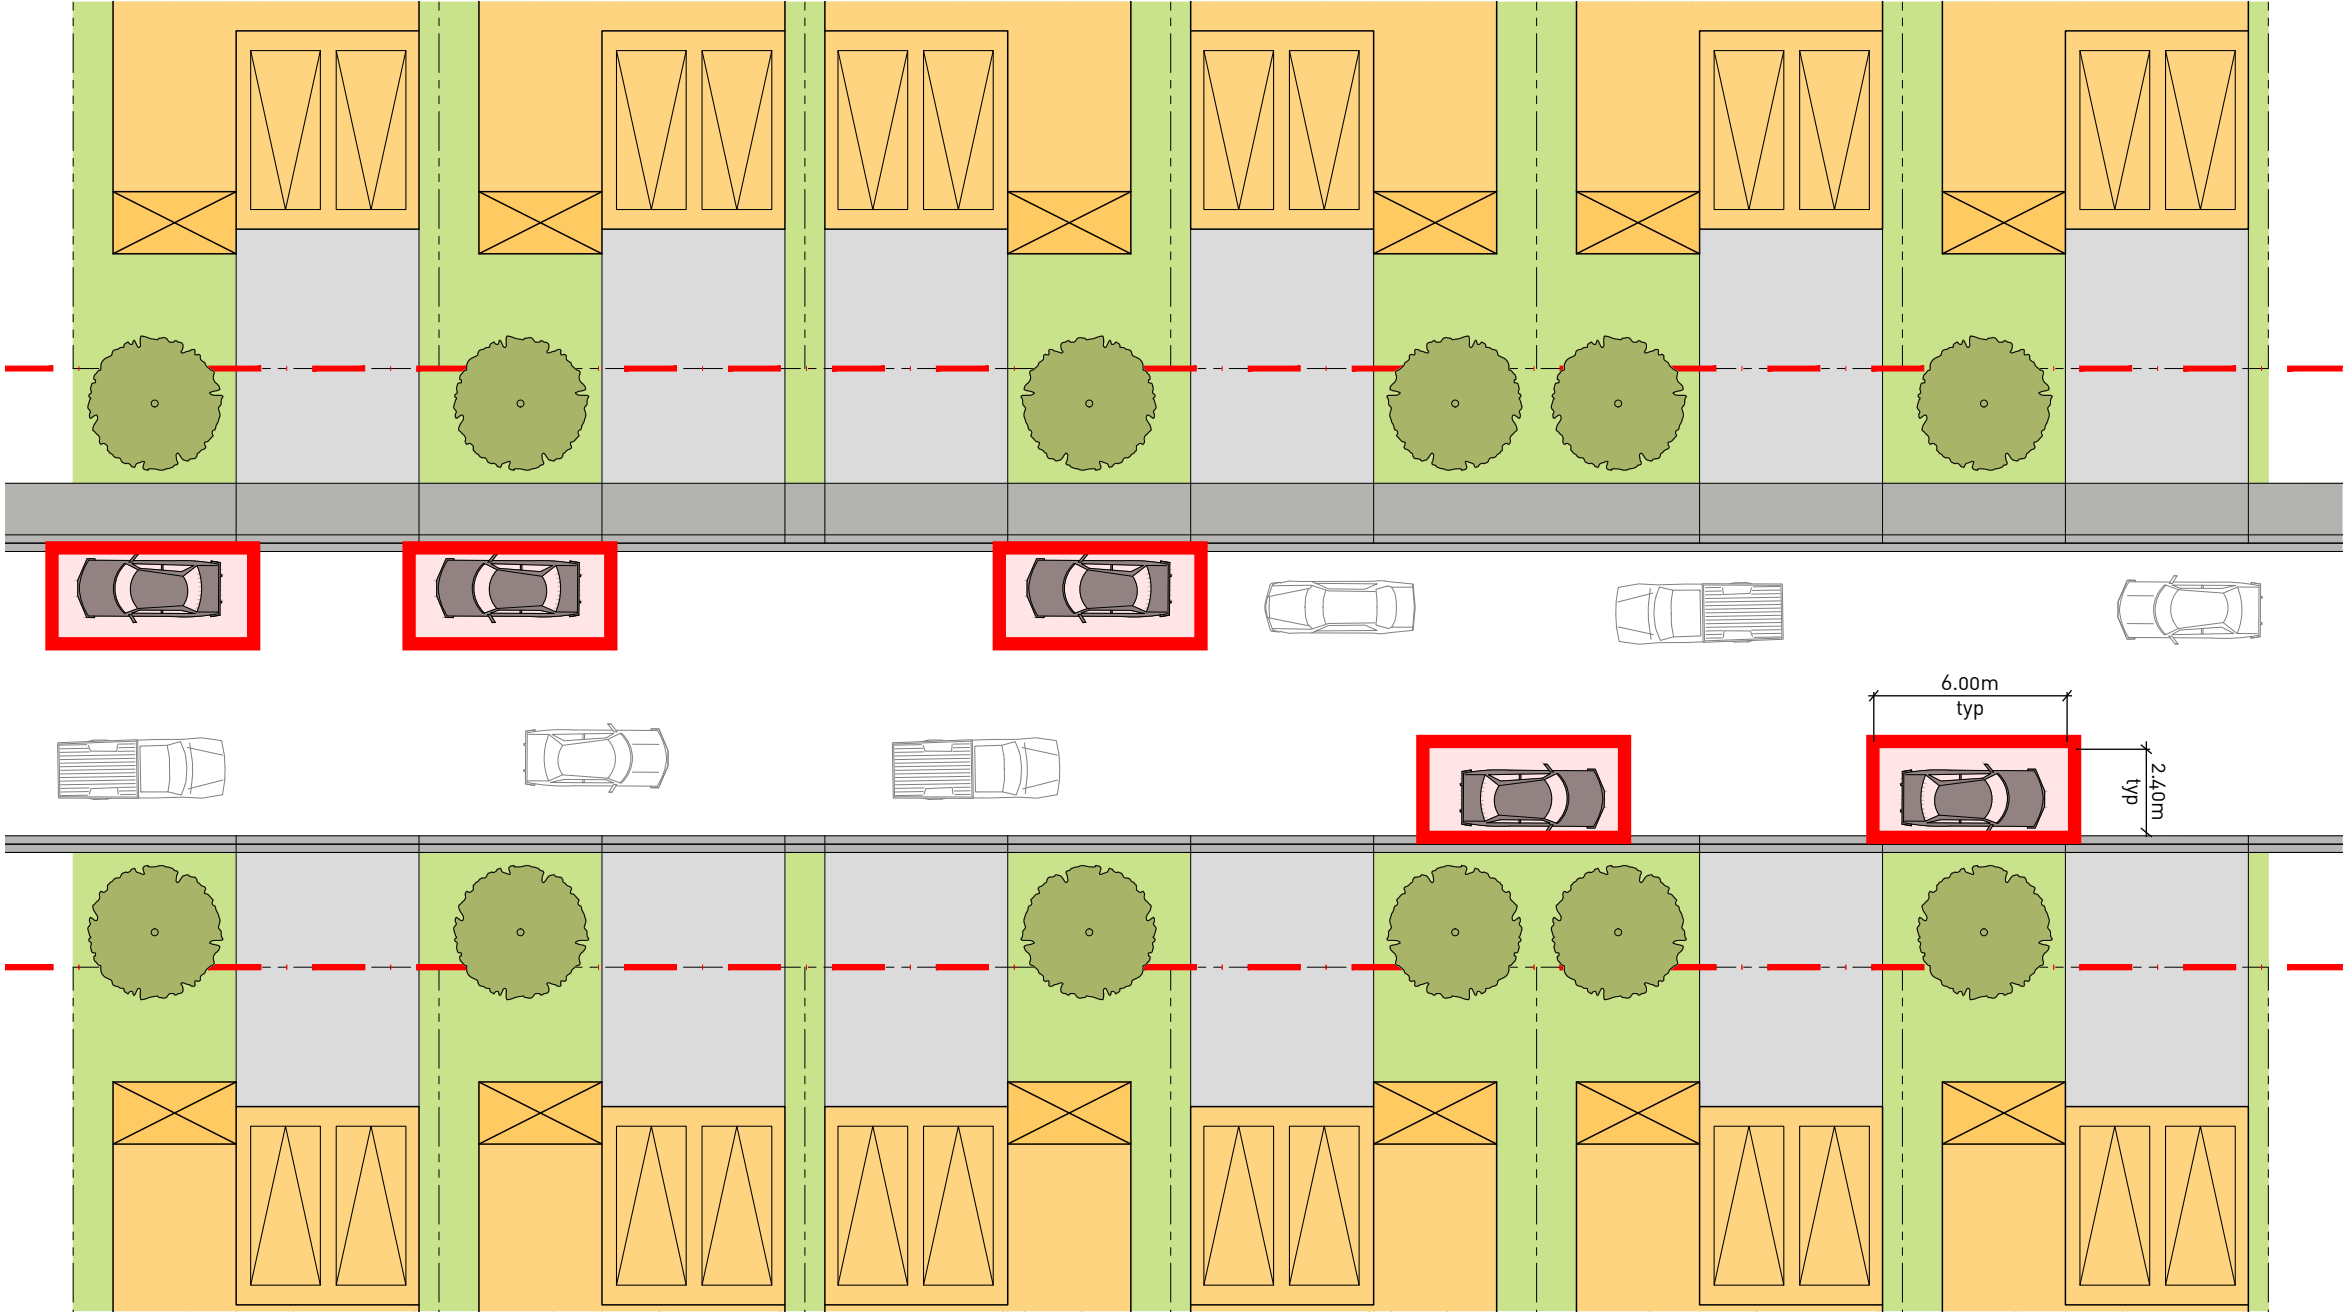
18.00m Local Road Alternating On-Street Parking Configuration
